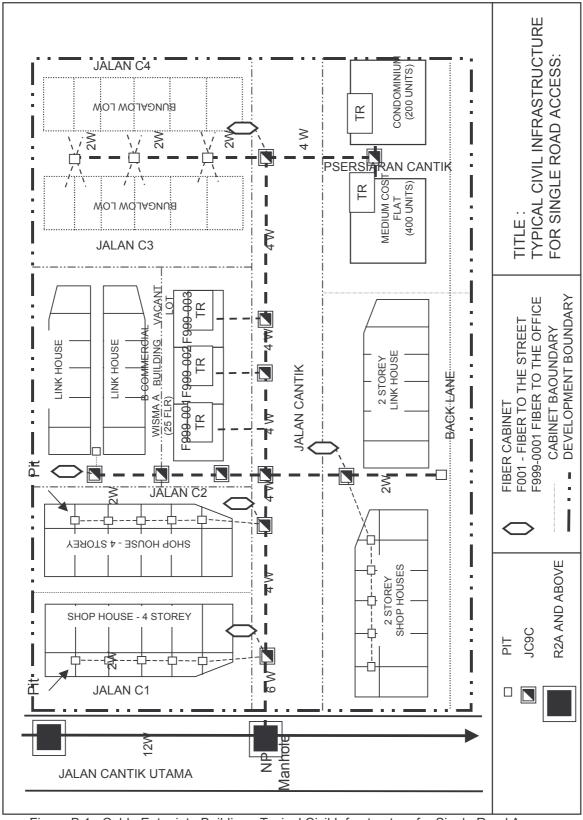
Cable Entry into Building - Typical Civil Infrastructure for Single Road Access
